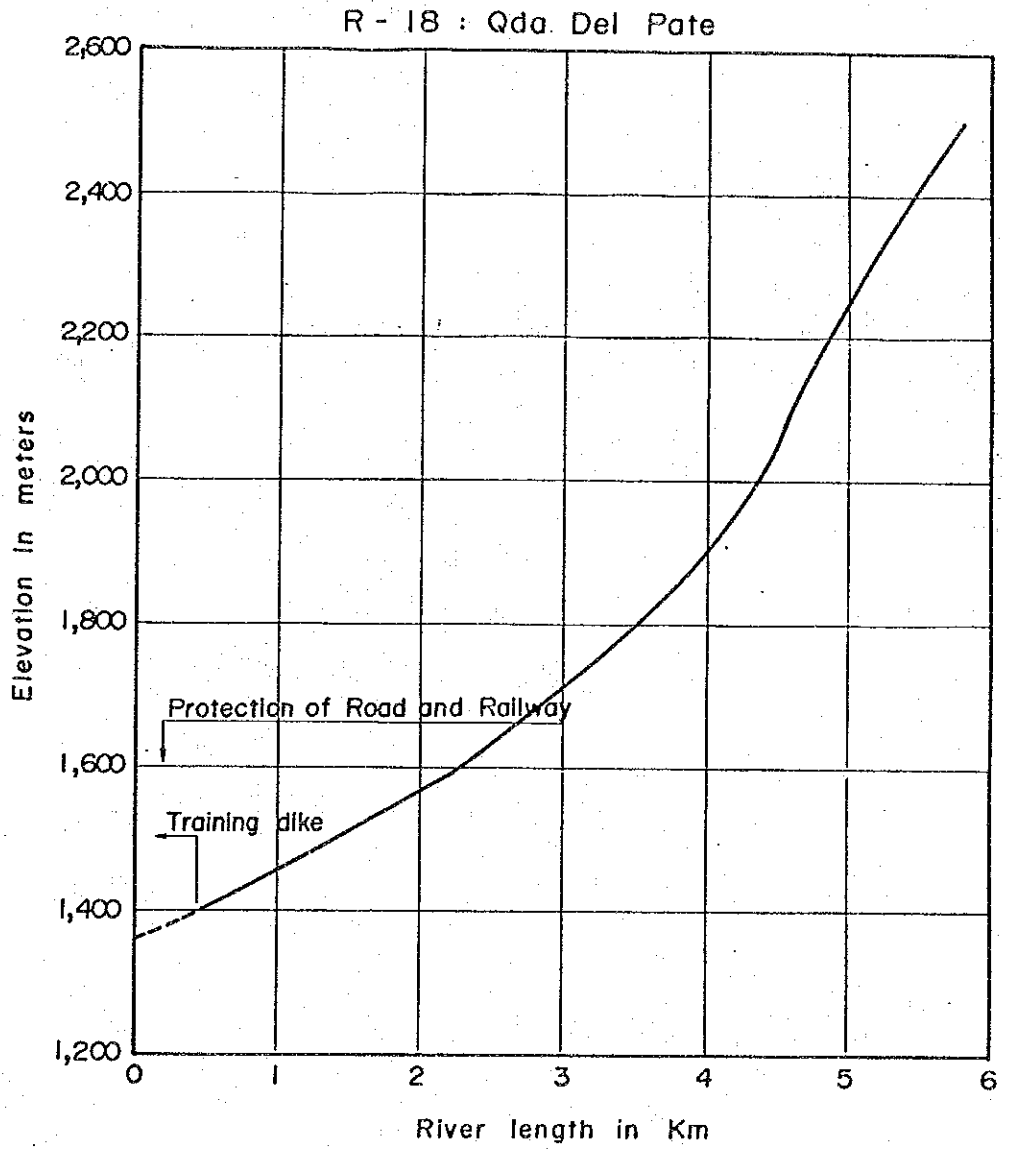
Structural Plan on Profile of Qda Del Pate (R18)
